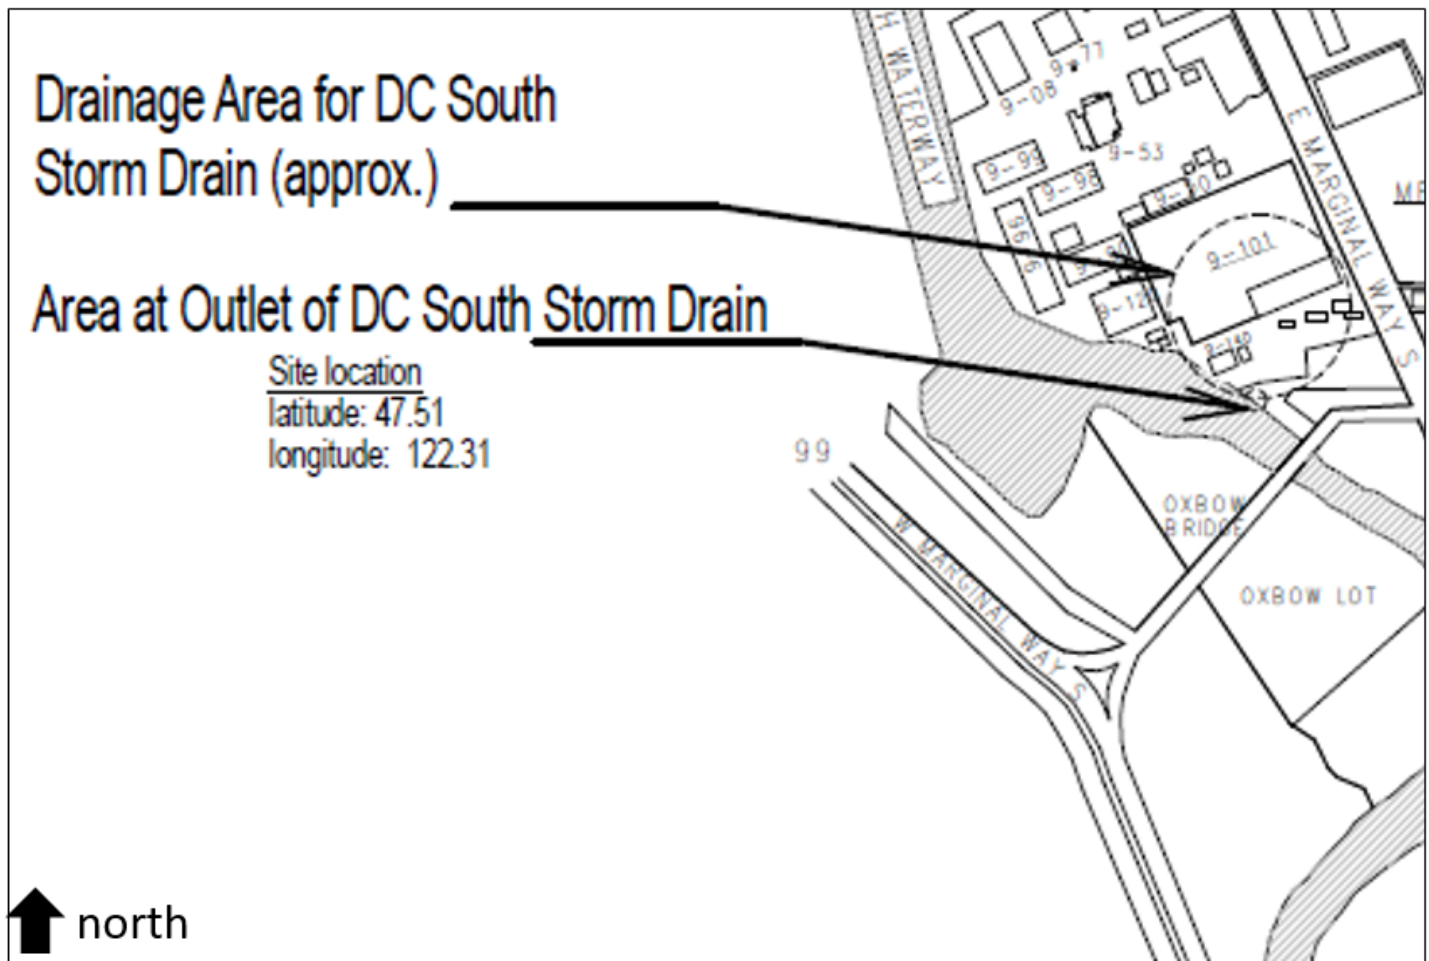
Area of Site drained by South Storm Drain stormwater infrastructure.
